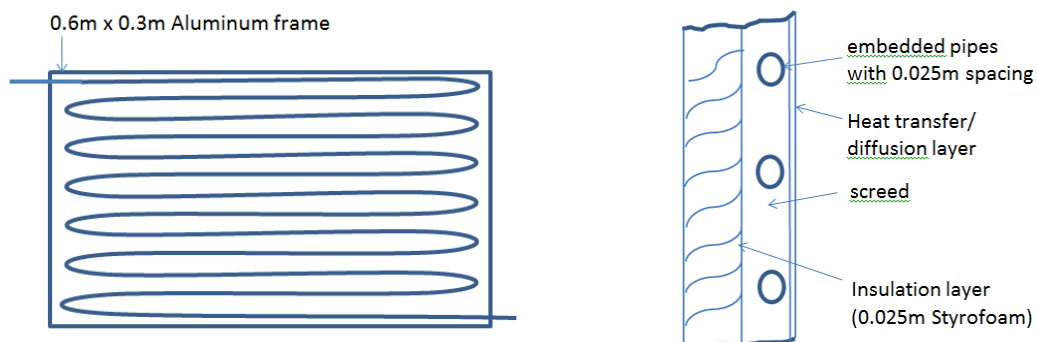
Schematic of proposed cooling panel layout and section (not to scale)
